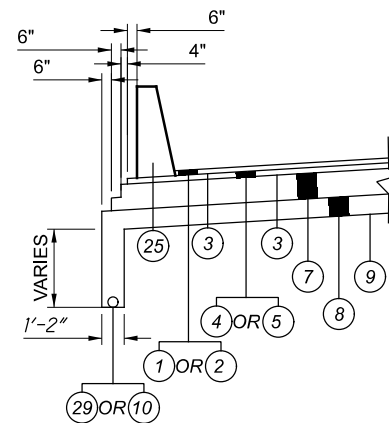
CURBED-HIGH SIDE OF SUPERELEVATED SECTION FOR SHOULDER WIDTHS OF 4' TO 6'
